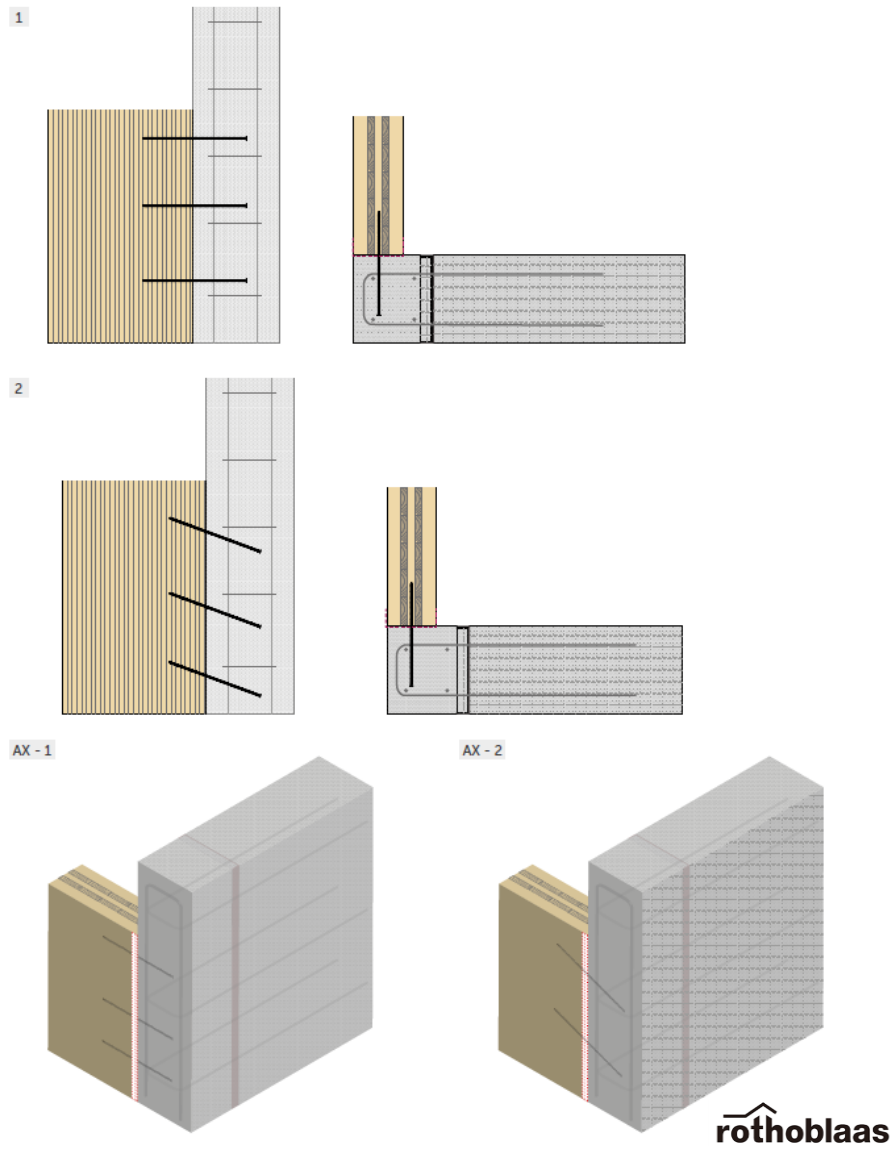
CLT wall to Concrete wall connection (copyright Rothoblaas)
